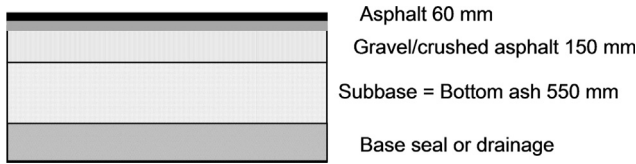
Schematic cross-section of road construction with MSWI-BA subbase layer.
